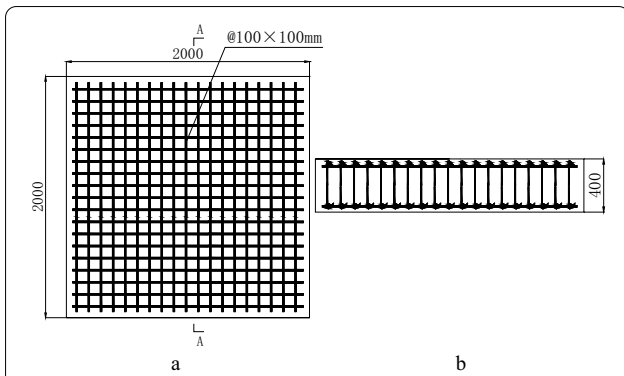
The reinforcement of the steel-fiber reinforced concrete slab: a front view of slab. b Sectional view of A–A.
